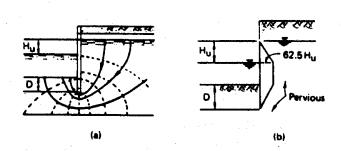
Hydrostatic and Seepage Pressures (after Terzaghi, 1954)
